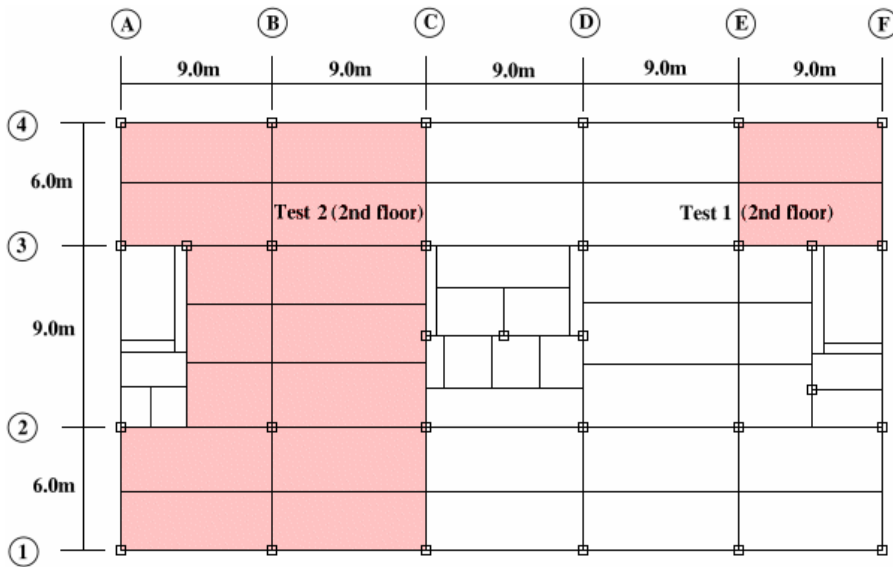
Floor plan showing where tests conducted by BRE took place (Newman, 2000)
